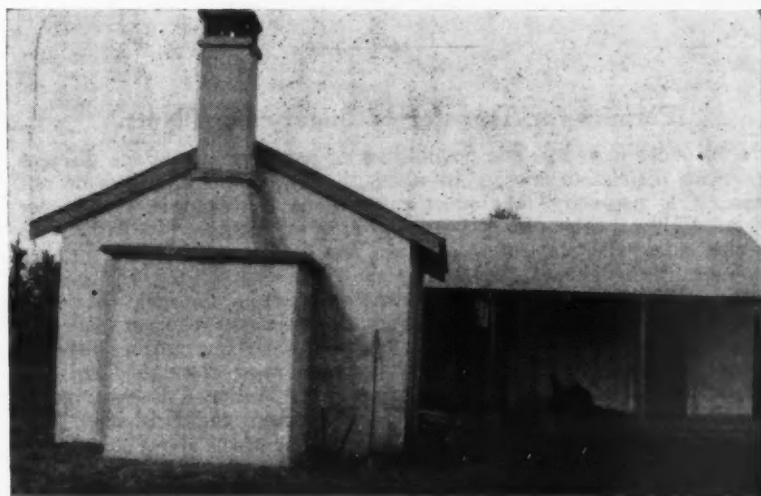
Another view of the barracks and cookhouse constructed of concrete.
